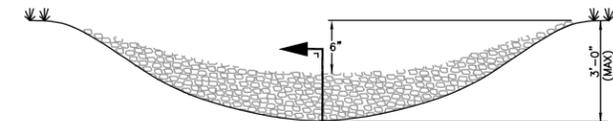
RD-C3 DRAINAGE CHANNEL
